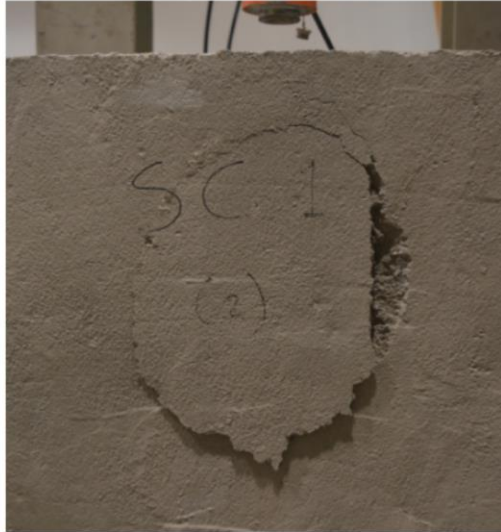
Longitudinal shear of the concrete slab for specimen series SC-FR.
